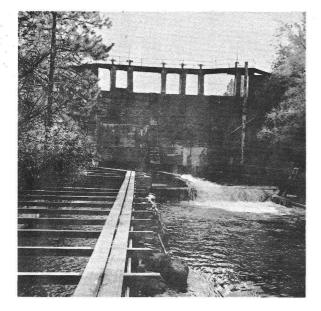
Silver Lake Ditch Flume on Left with Wallowa River on Right and Dam in Background. (Oct. 11, 1959)
